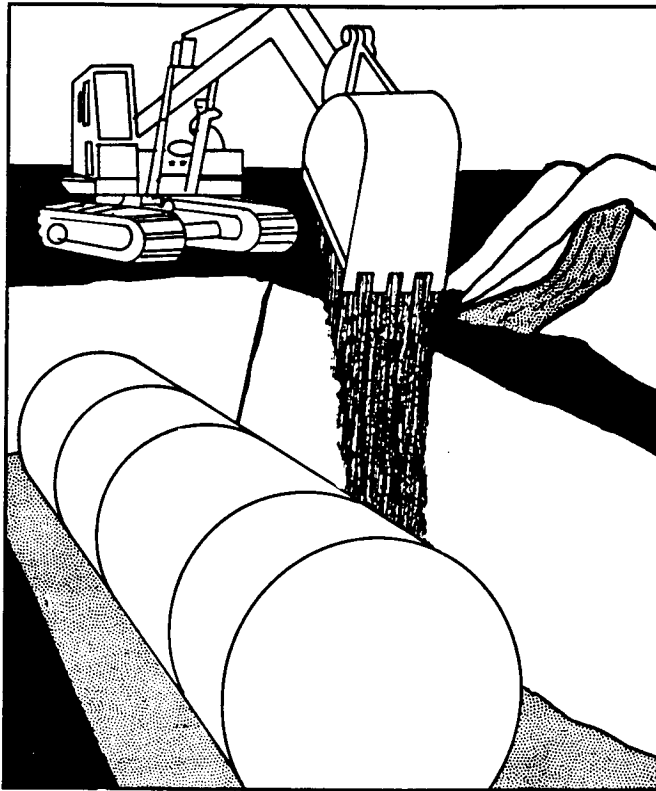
Backfilling. Careful selection, placement and compaction of backfill material is essential to properly support and protect the tank and piping after installation.
